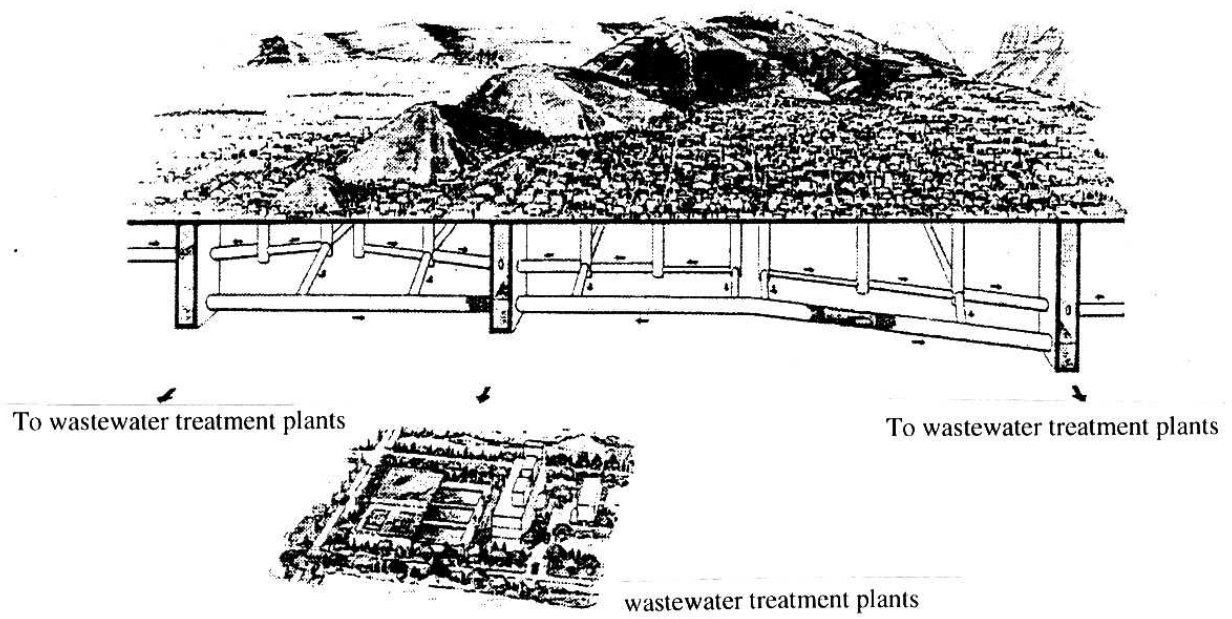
Schematic Plan of Network of Wastewater Treatment Plants
